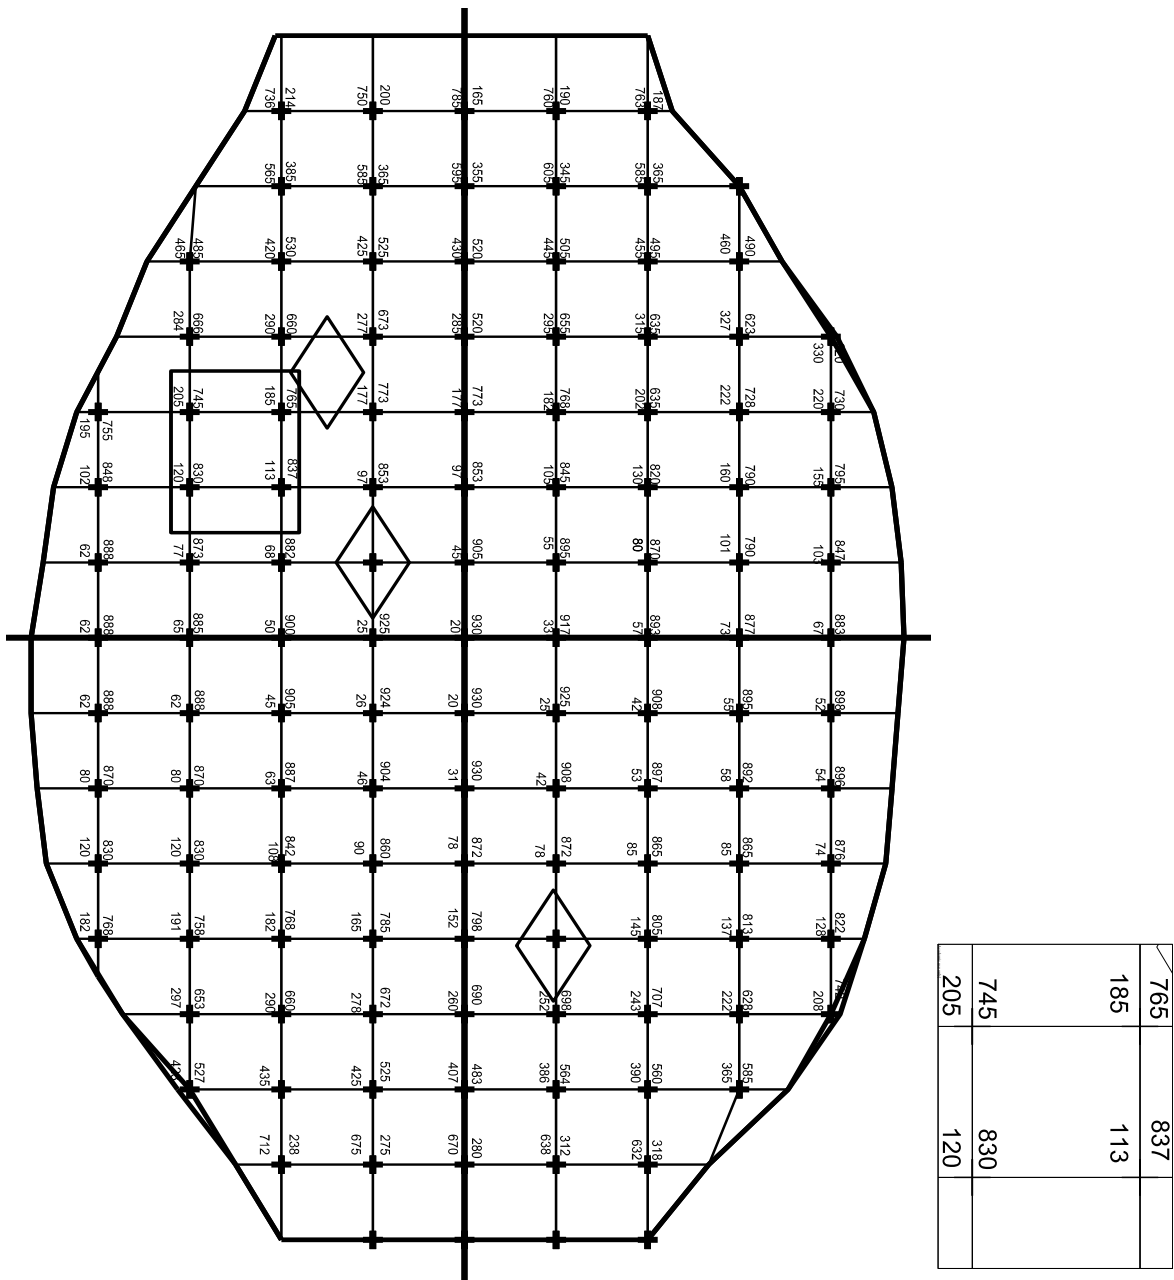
The plan of the shell is divided into 4 sections. The distance from the 950mm high measuring frame was recorded. The height of this point from finished floor level was simply subtracted from 950mm. Excerpted from the larger plan diagram, the extract shows measured dimensions at the left of the intersection point. The worked out vertical distance from finished floor level is calculated by subtracting it from 950mm set as datum.
